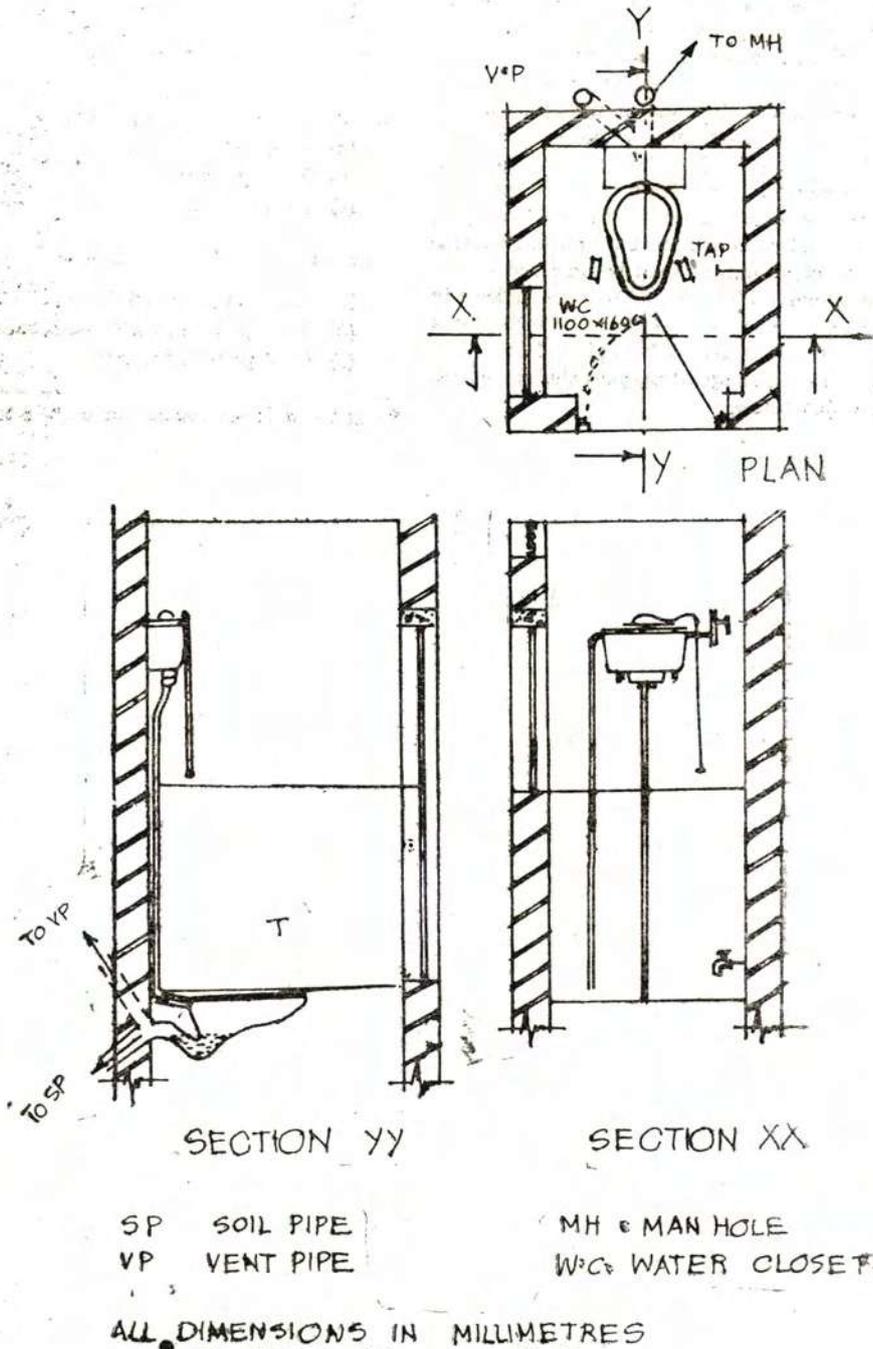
FIG TYPICAL LAYOUT OF WATER CLOSET WITH SQUATTING PAN
